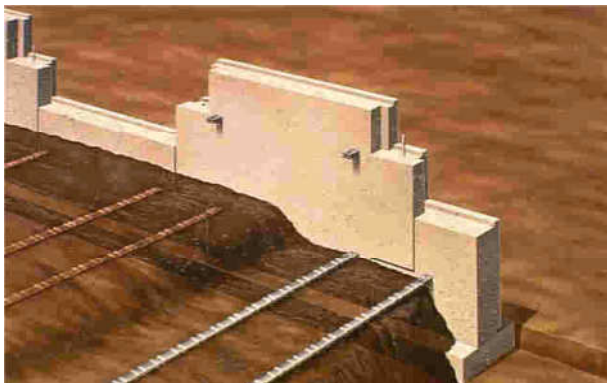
Reinforced earth wall construction with galvanized metal strip.
